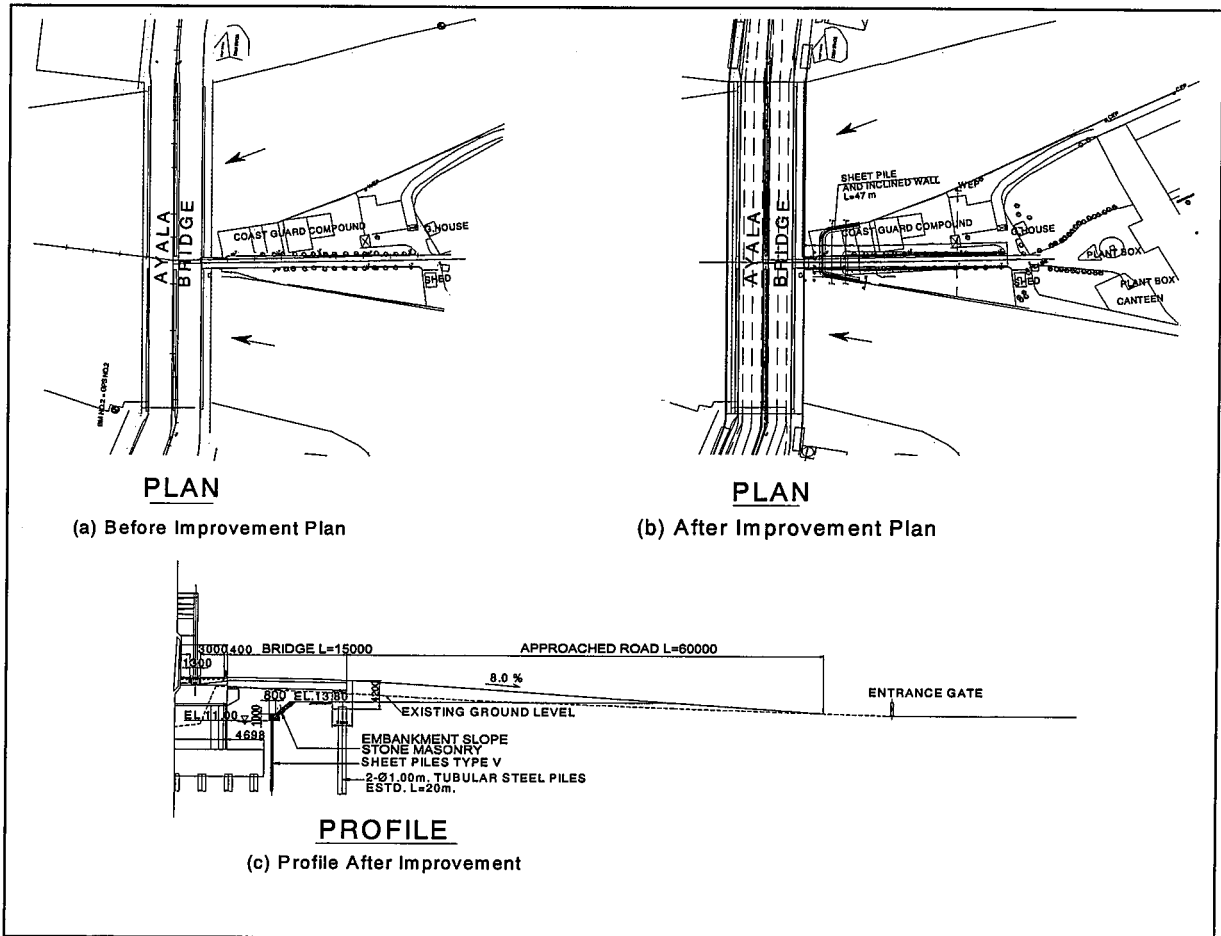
Access Road to Hospicio De San Jose
